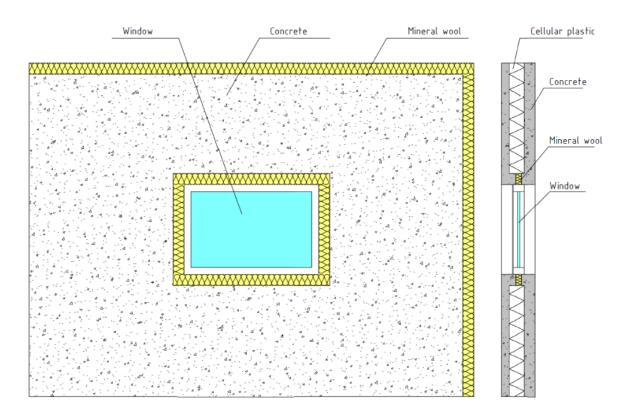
Typical design of sandwich walls with safety barriers in connection with windows and element joints.
